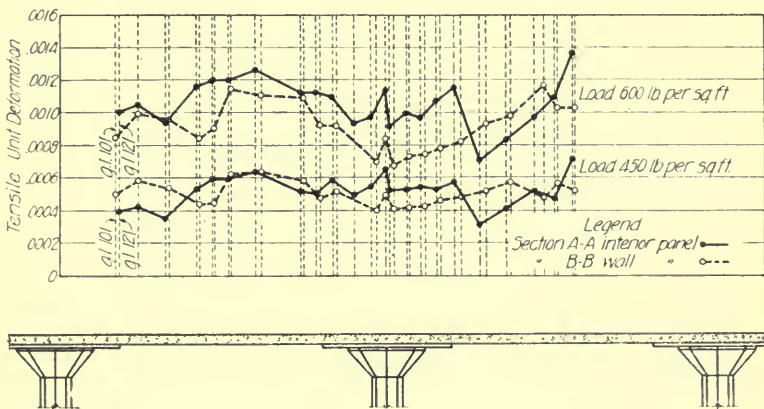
STRAIN DISTRIBUTION FOR REINFORCEMENT IN WALL PANEL AND INTERIOR PANEL OF SLAB J.
